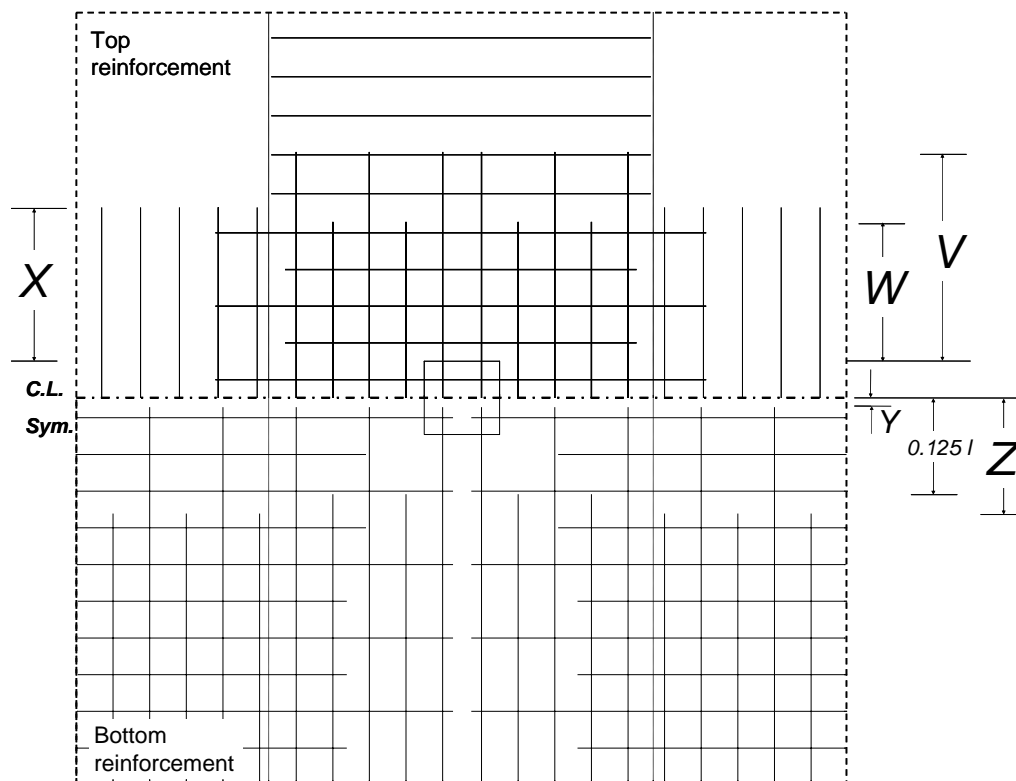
Notation for minimum length requirement of slab reinforcement
